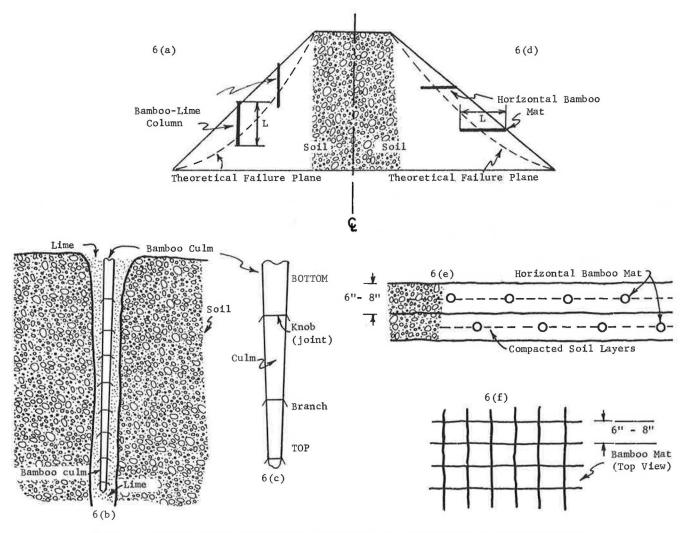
Proposed Field Installation Procedures for Bamboo Used as Reinforced Earth
